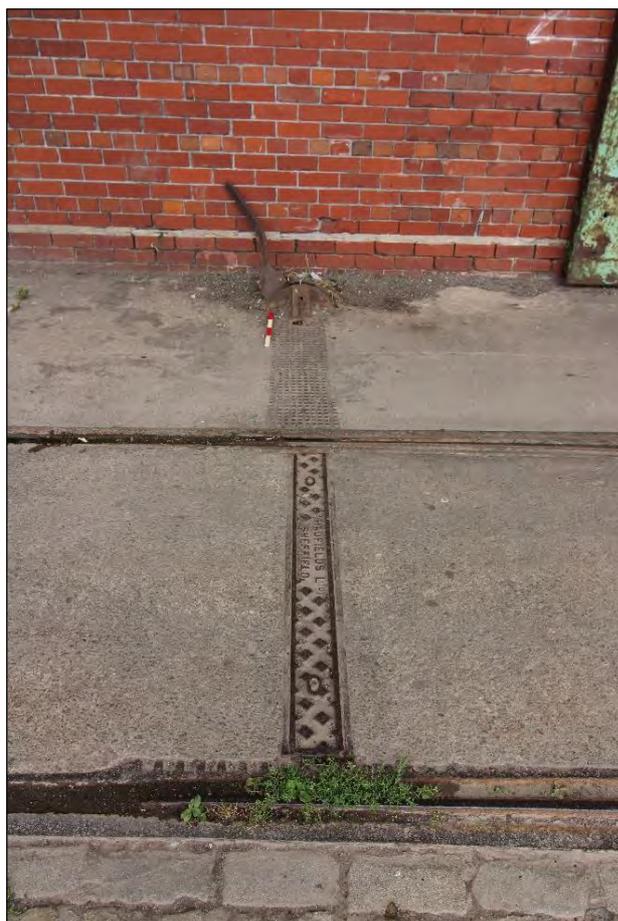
Switch points, manufactured by Hadfields Ltd, Sheffield
